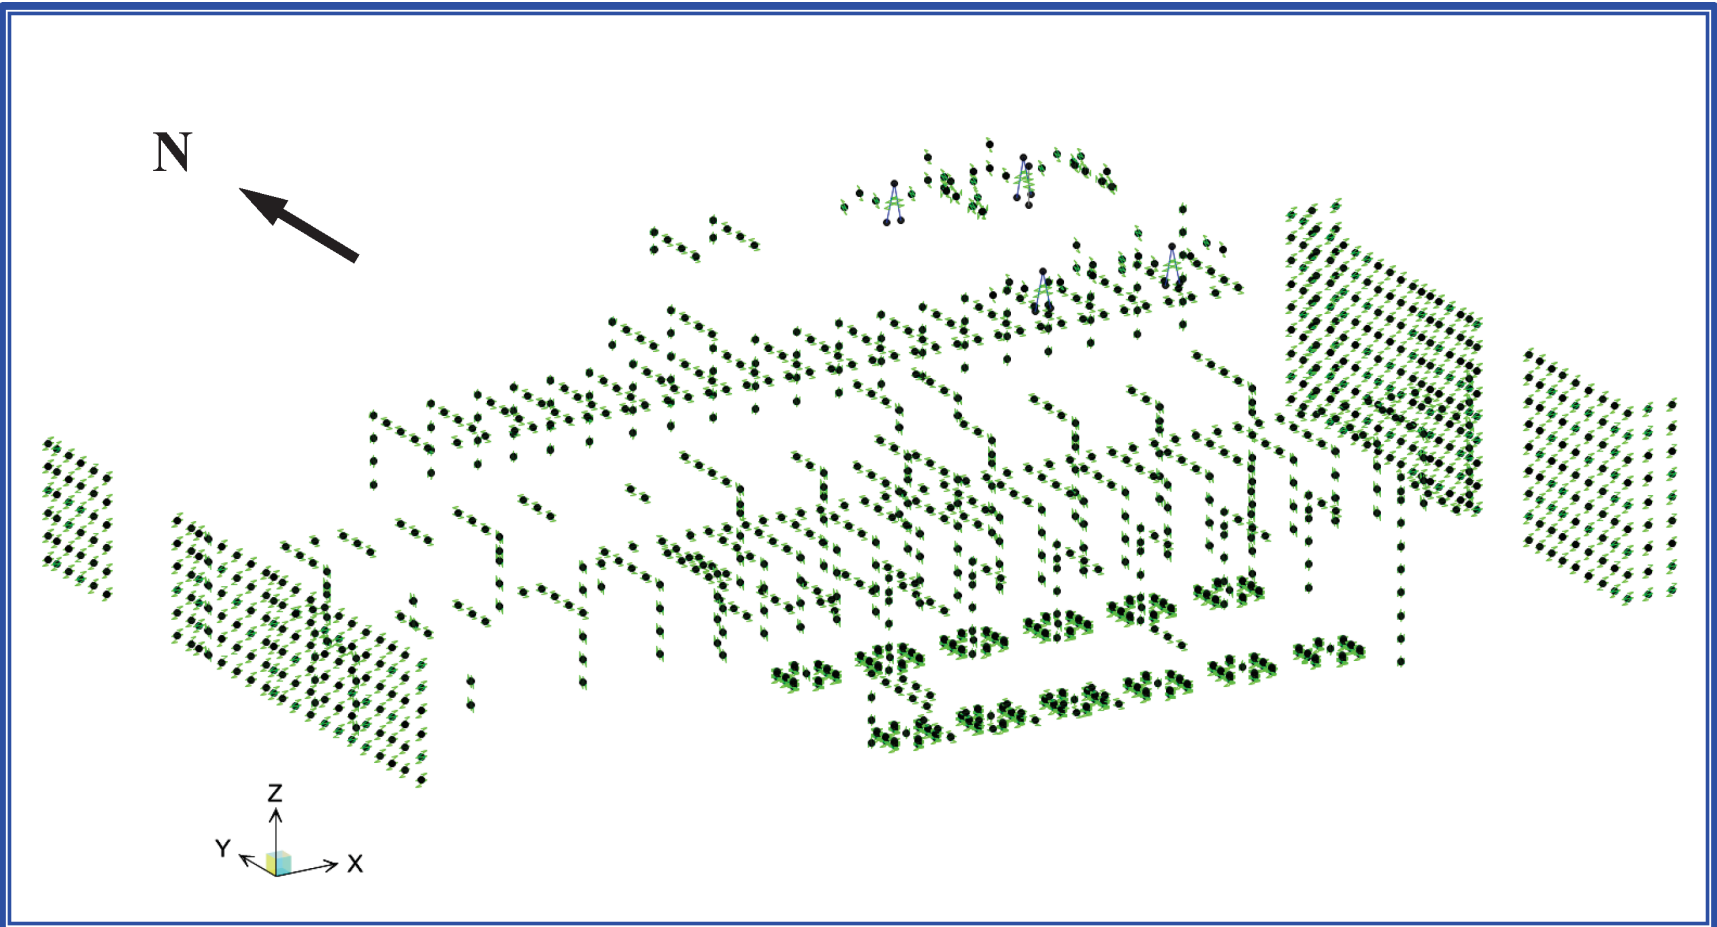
Elevation View of Triple Building SAP2000 Model Showing Separation
